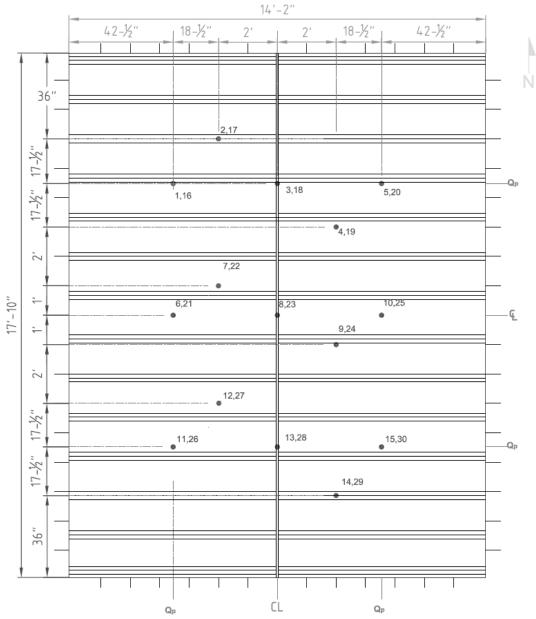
Thermocouple Locations on Roof Deck and Roof Felt.
